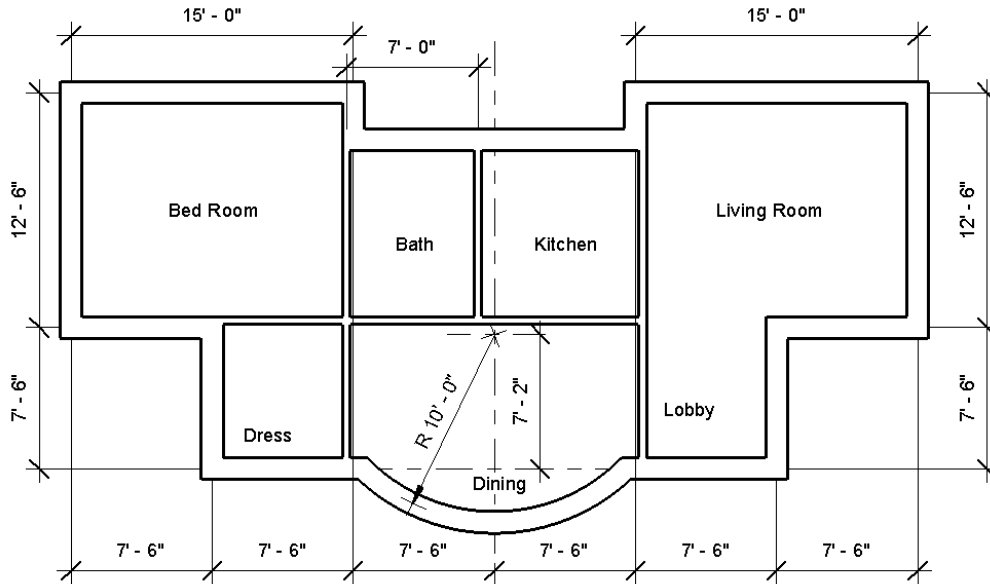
The sketch plan for creating the exterior and interior walls for the Apartment 2 project
